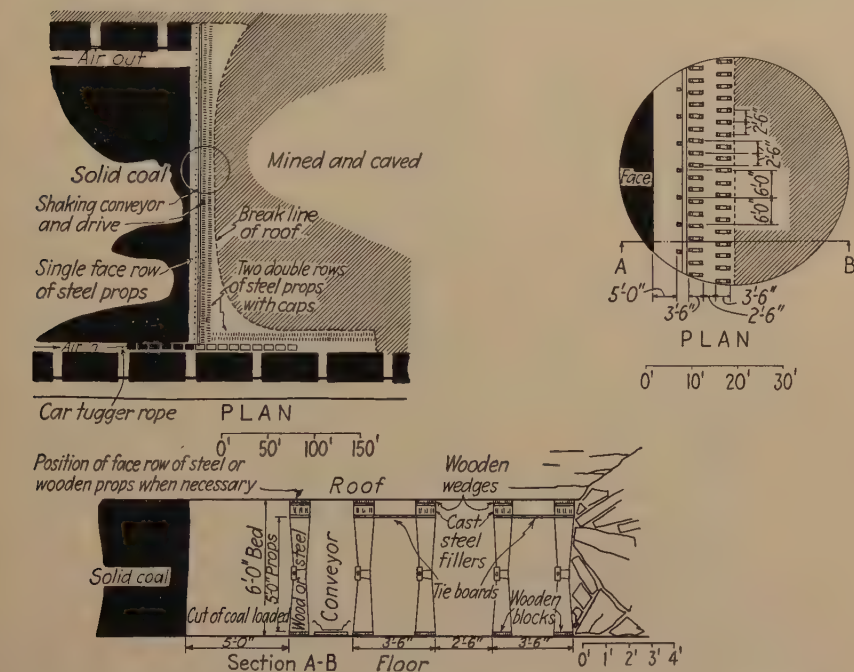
DETAILS OF LONGWALL FACE USING SHAKING CONVEYOR AND STEEL PROPS.
